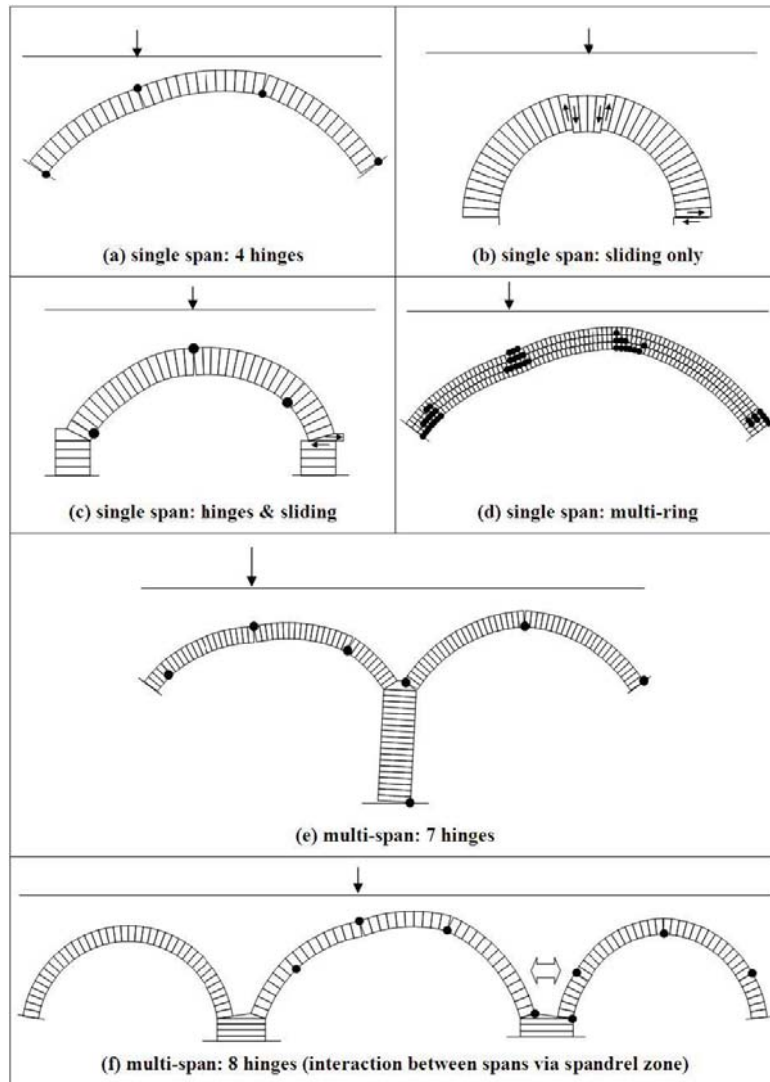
23 - Selection of potential failure modes (Gilbert, 2007)
